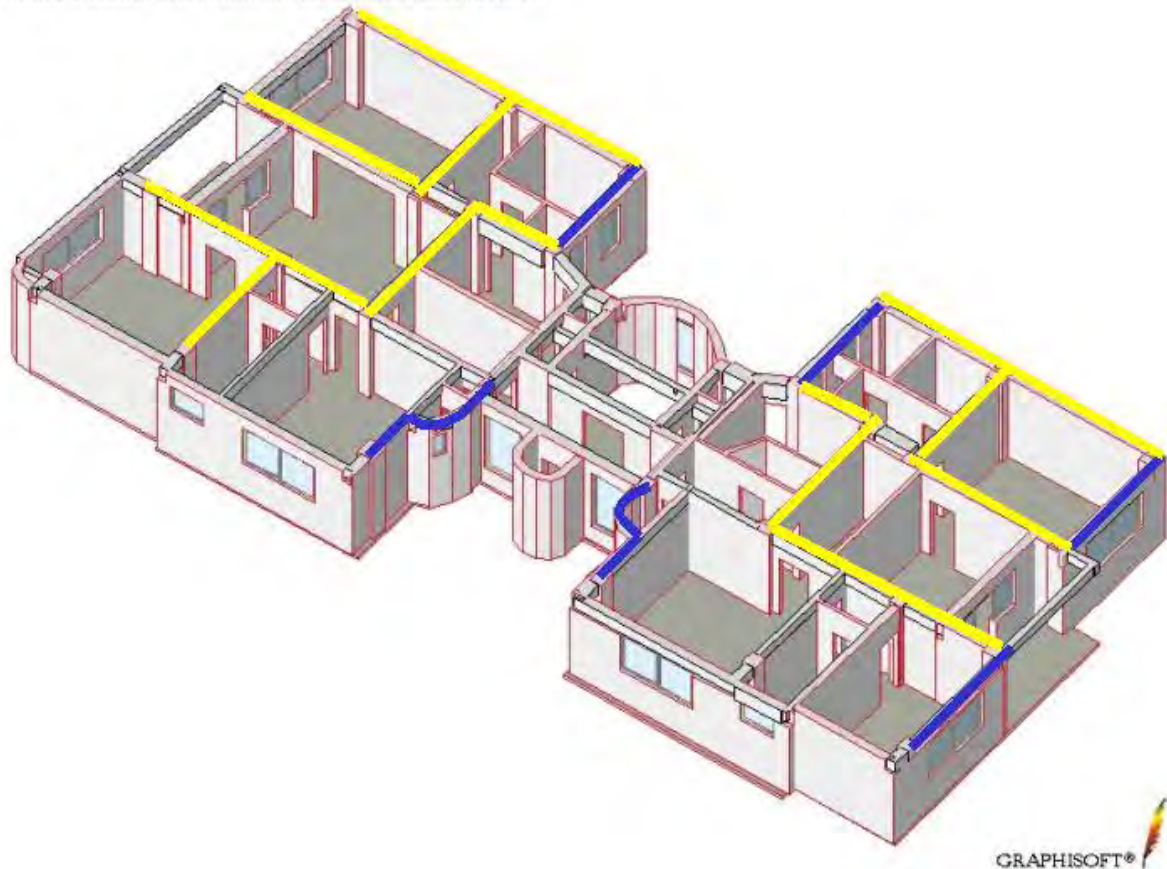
Axonometric view of a current floor. Frames infilled with 34cm masonry are marked with blue, frames infilled with 10-15cm masonry are marked with yellow in the section plane.
